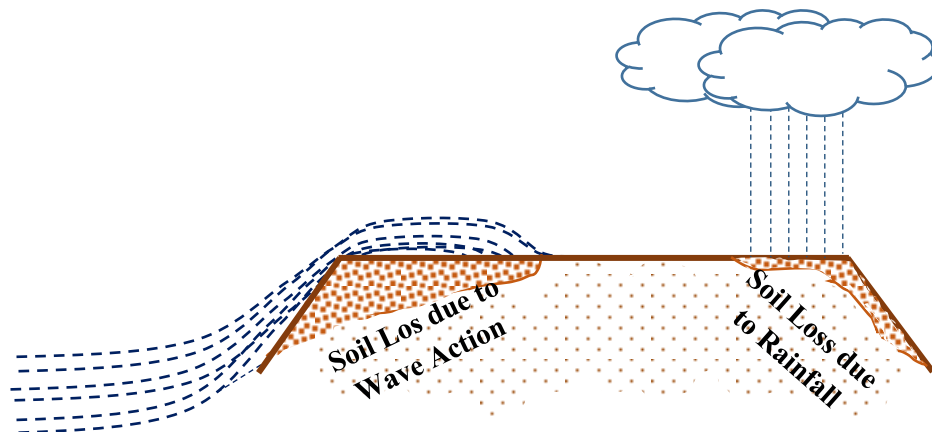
Failure of Unprotected Slope by Wave Action and Rainfall
